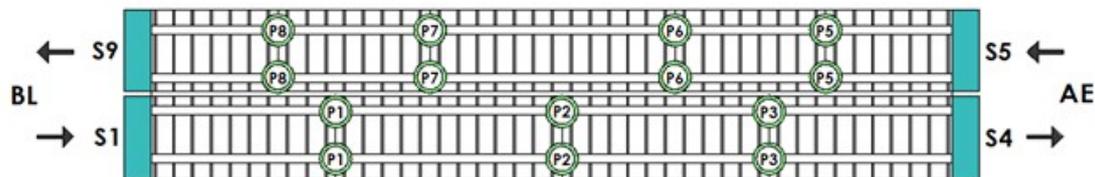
Piers and abutments IDs for the analyzed bridge case study.
